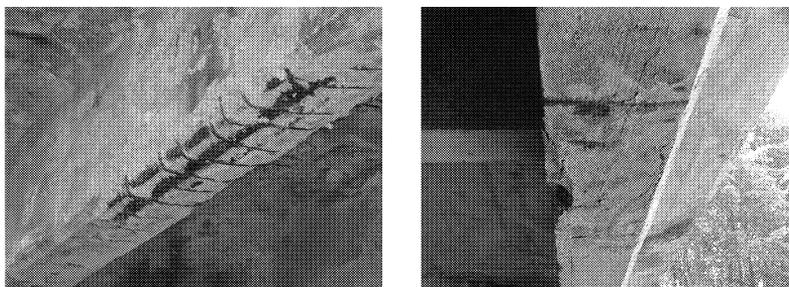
Typical failures – corrosion, longitudinal and transverse cracks, concrete cover dropping out
